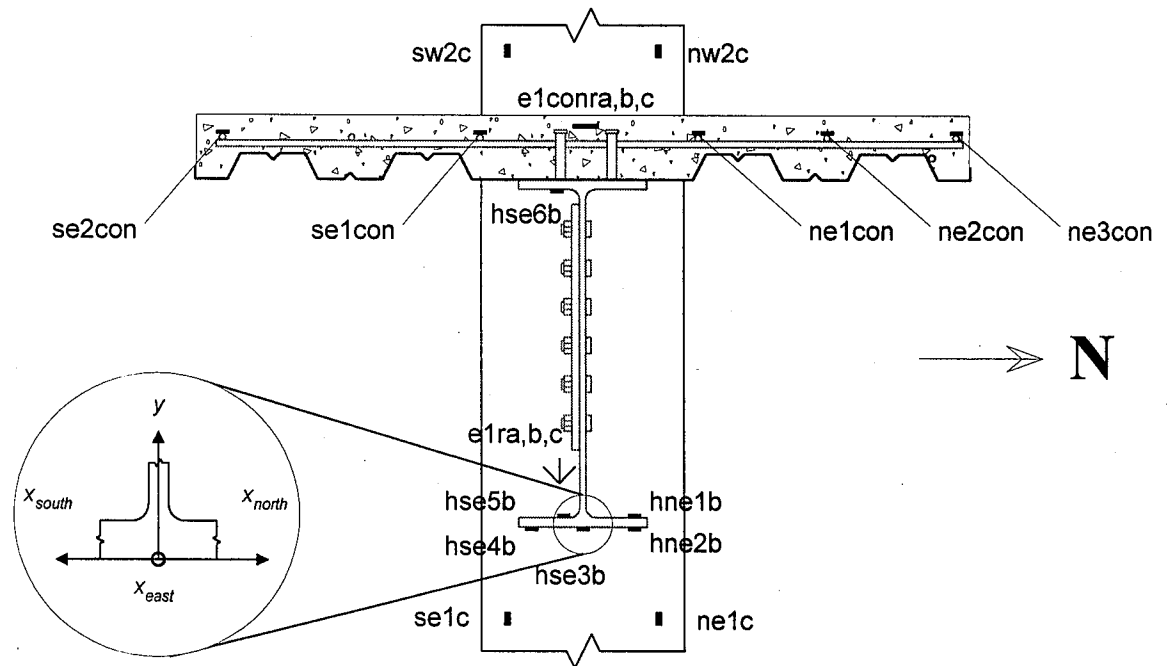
Section E-E: Strain Gages of East Girder Cross Section
